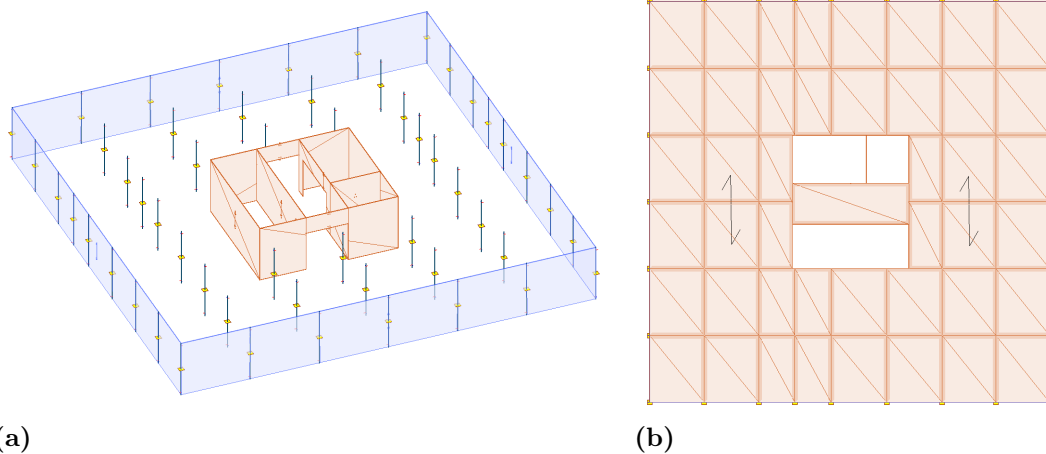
(a) One storey of the column FE model. Surrounding blue panels are cover elements used to distribute facade loads (b) The main direction of CLT floors
